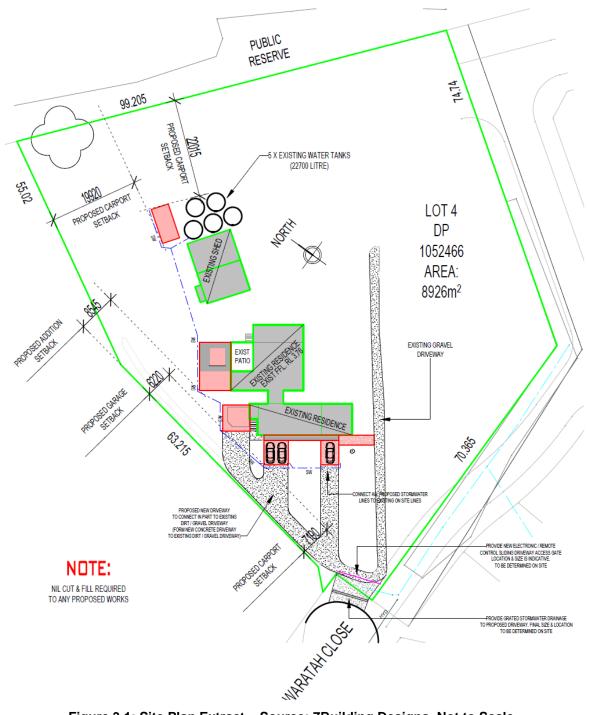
Site Plan Extract – Source: 7Building Designs. Not to Scale.
